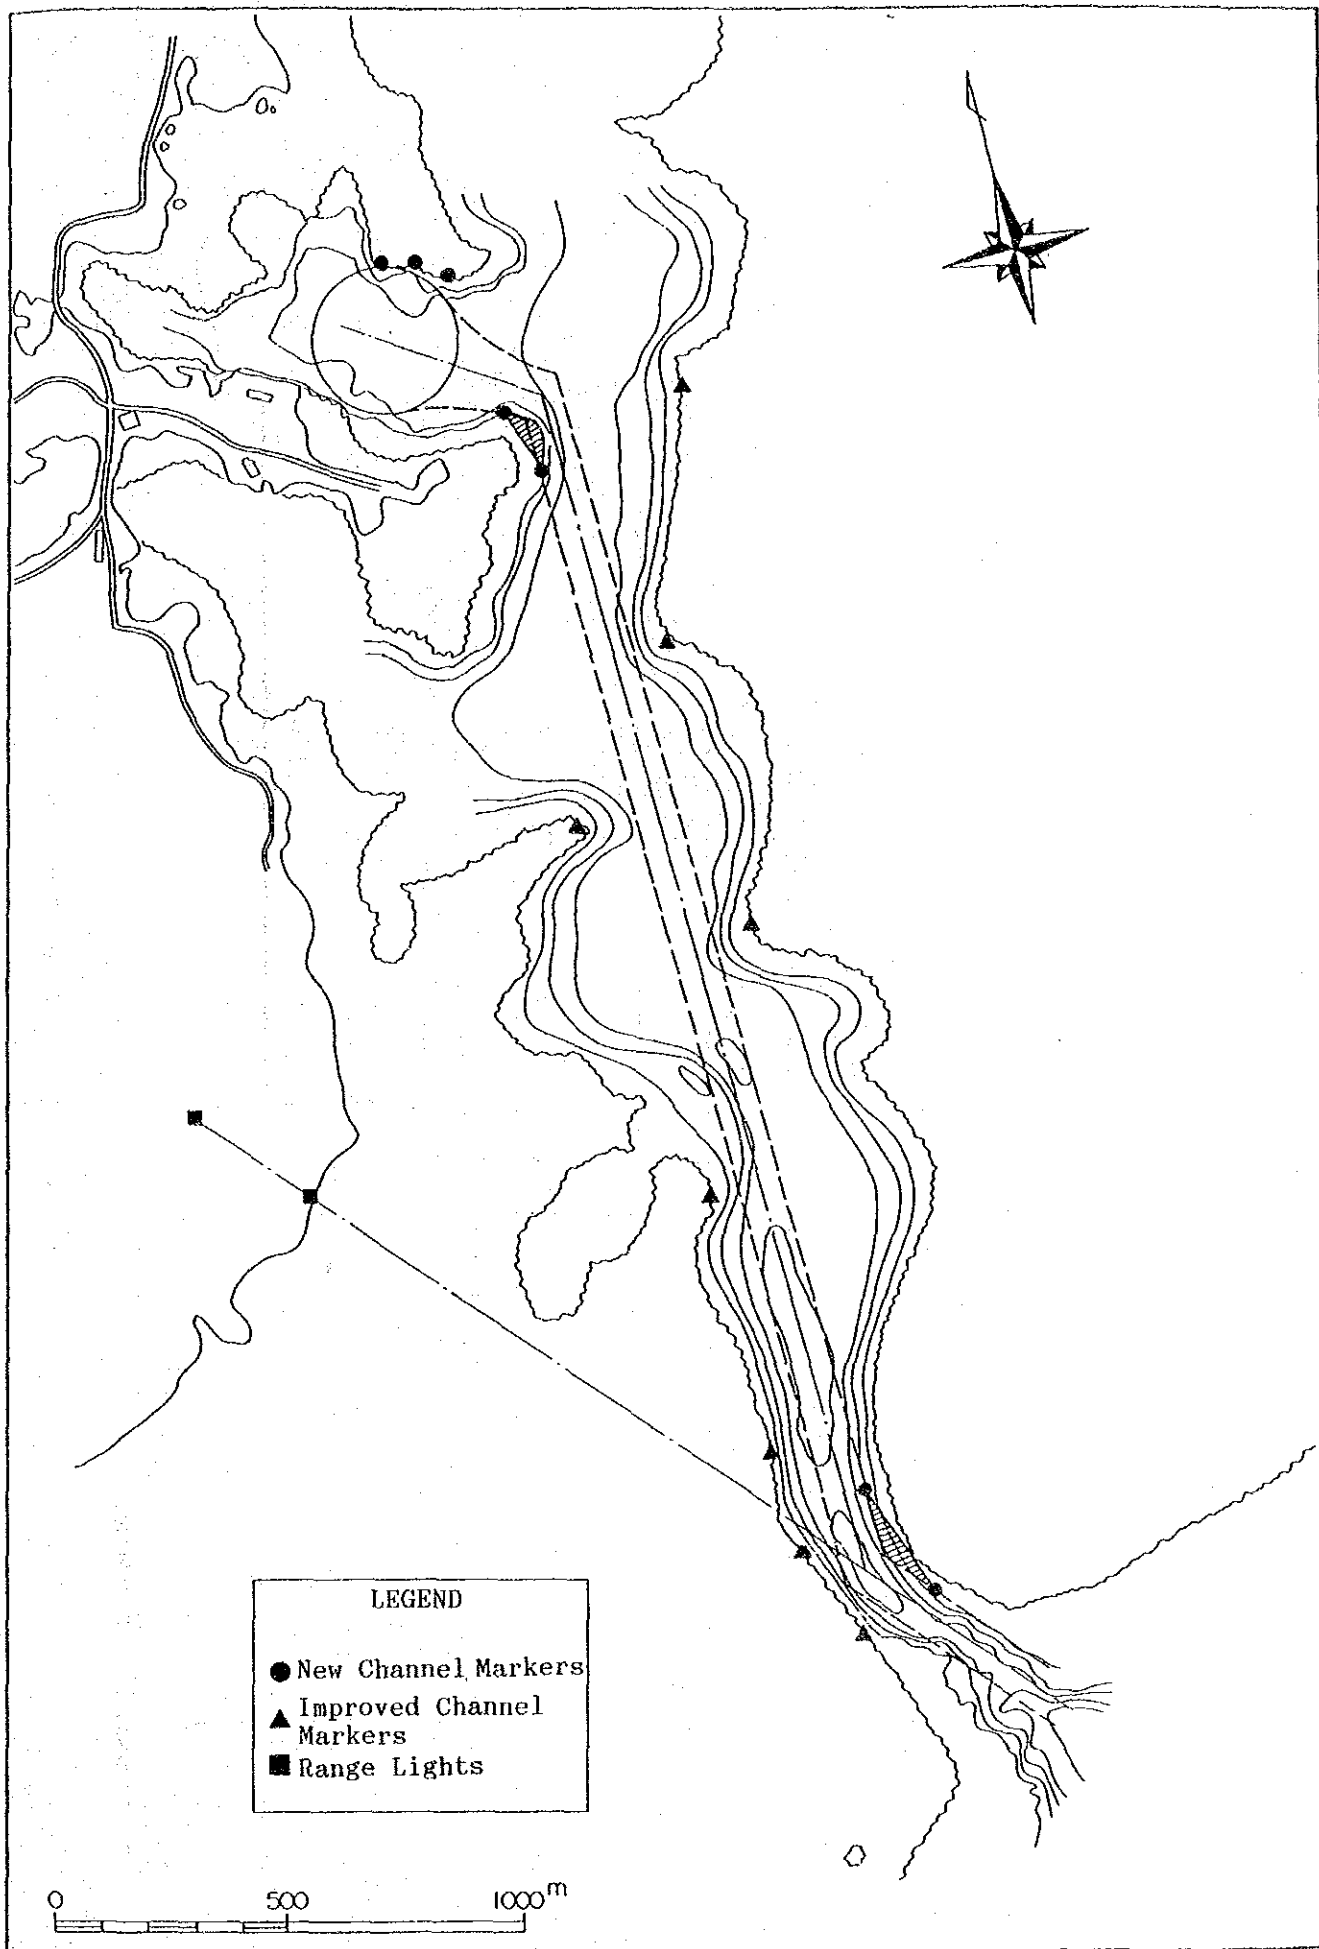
Location Plan of New and Improved Navigation Aid Markers
